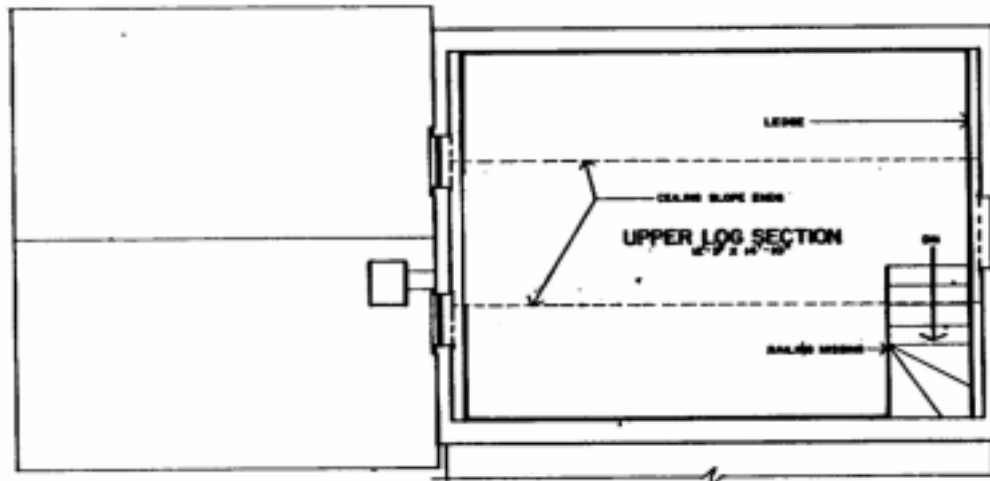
Plans of Solitude outbuilding by Gibson Worsham, from *Historic Structure Report*, 1989.
